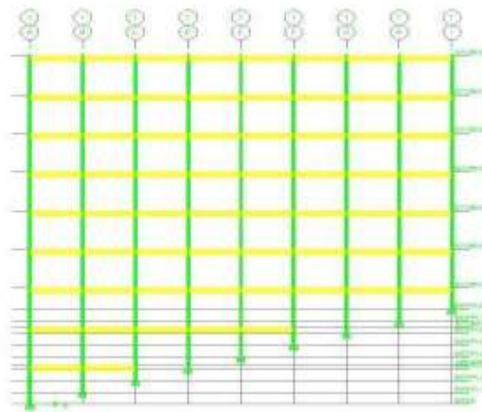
Elevation of step back building for eight storey model (300 slope)
